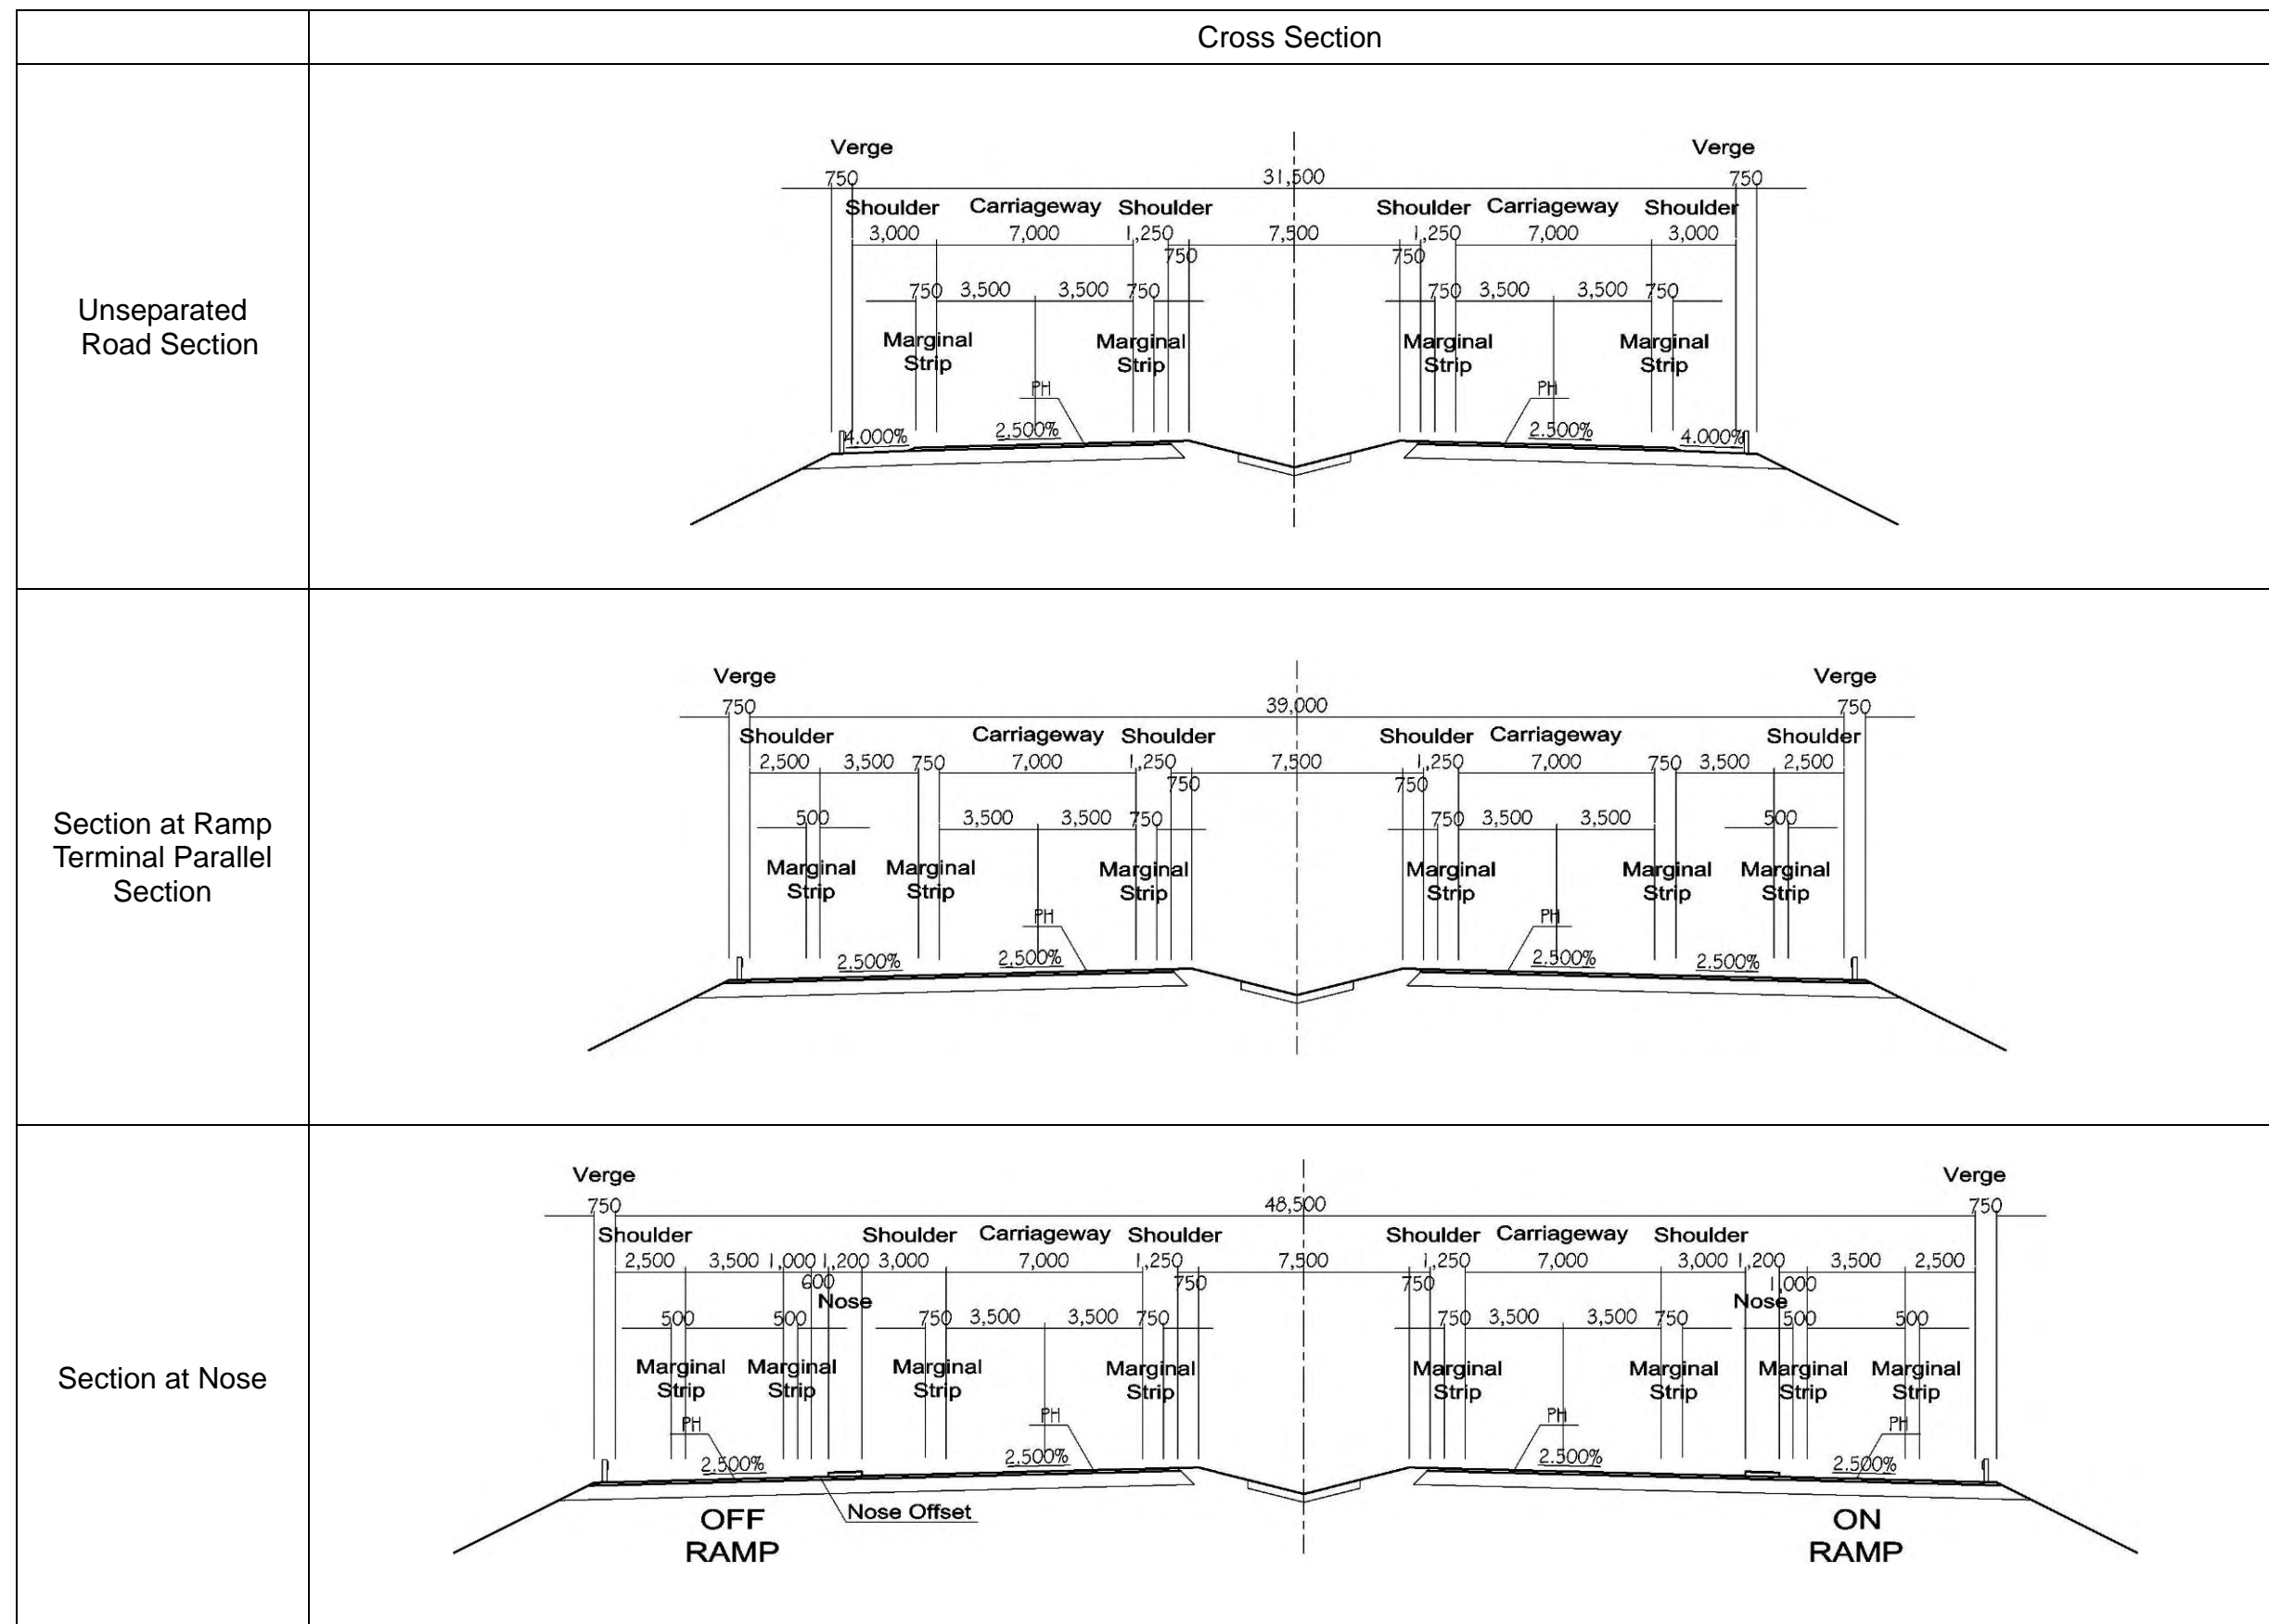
Cross Section of Ramp Terminal (Initial Stage)
